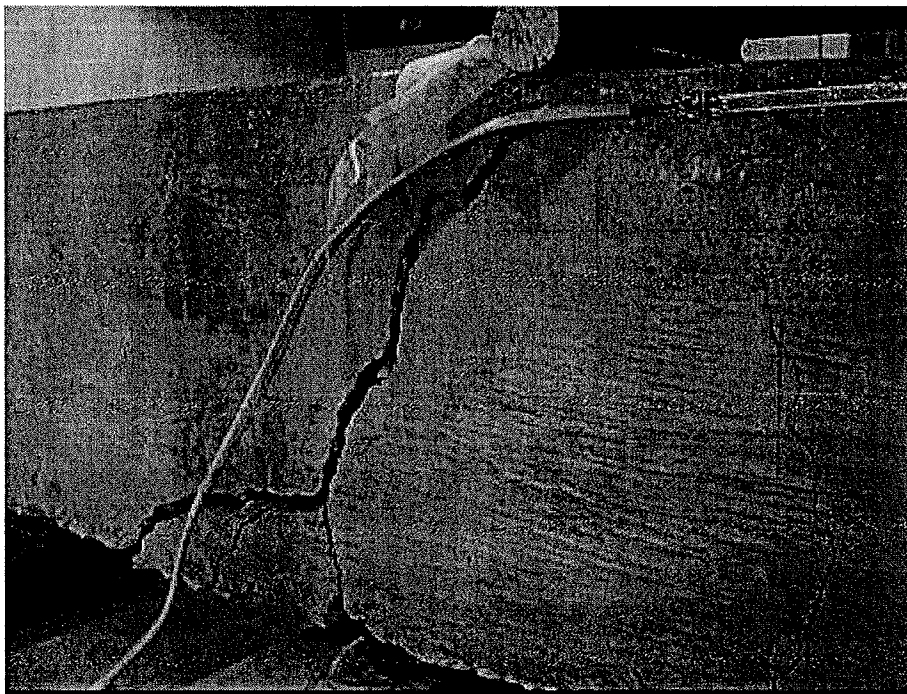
Close up of the shear crack in the BRC -3 beam.
